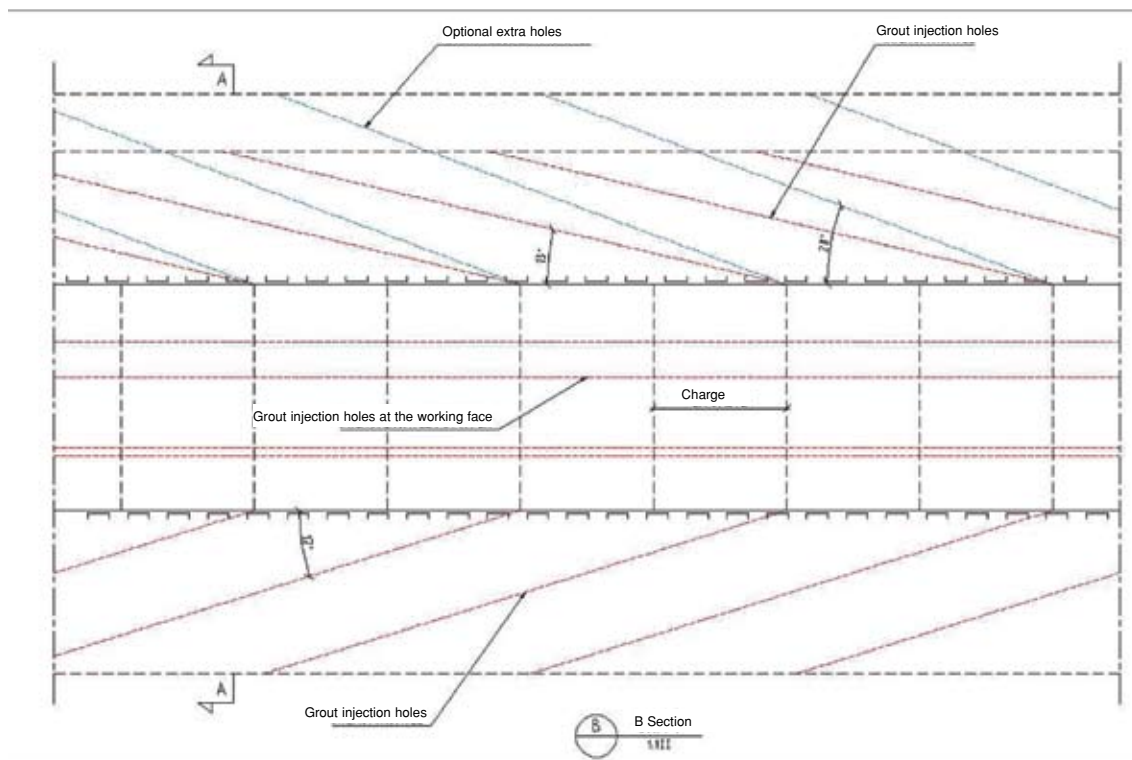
Longitudinal section of grout covers for every other charge in the Løren Tunnel.
